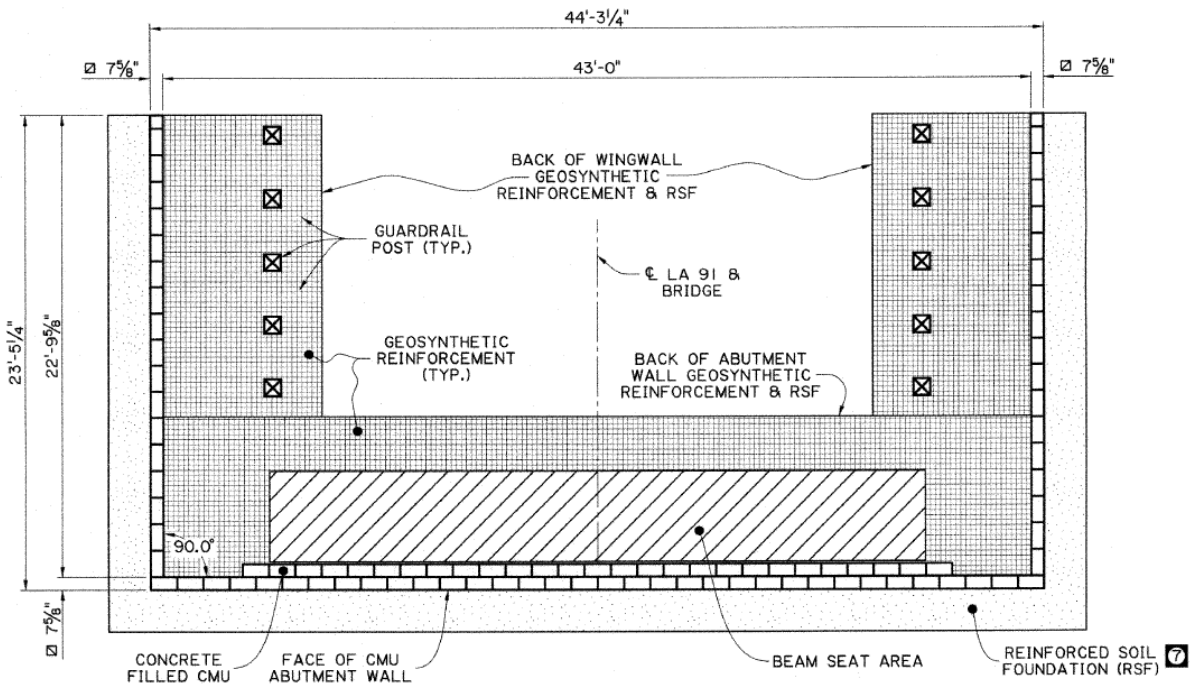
Diagram. GRS abutment plan view of Unnamed Creek Bridge.
